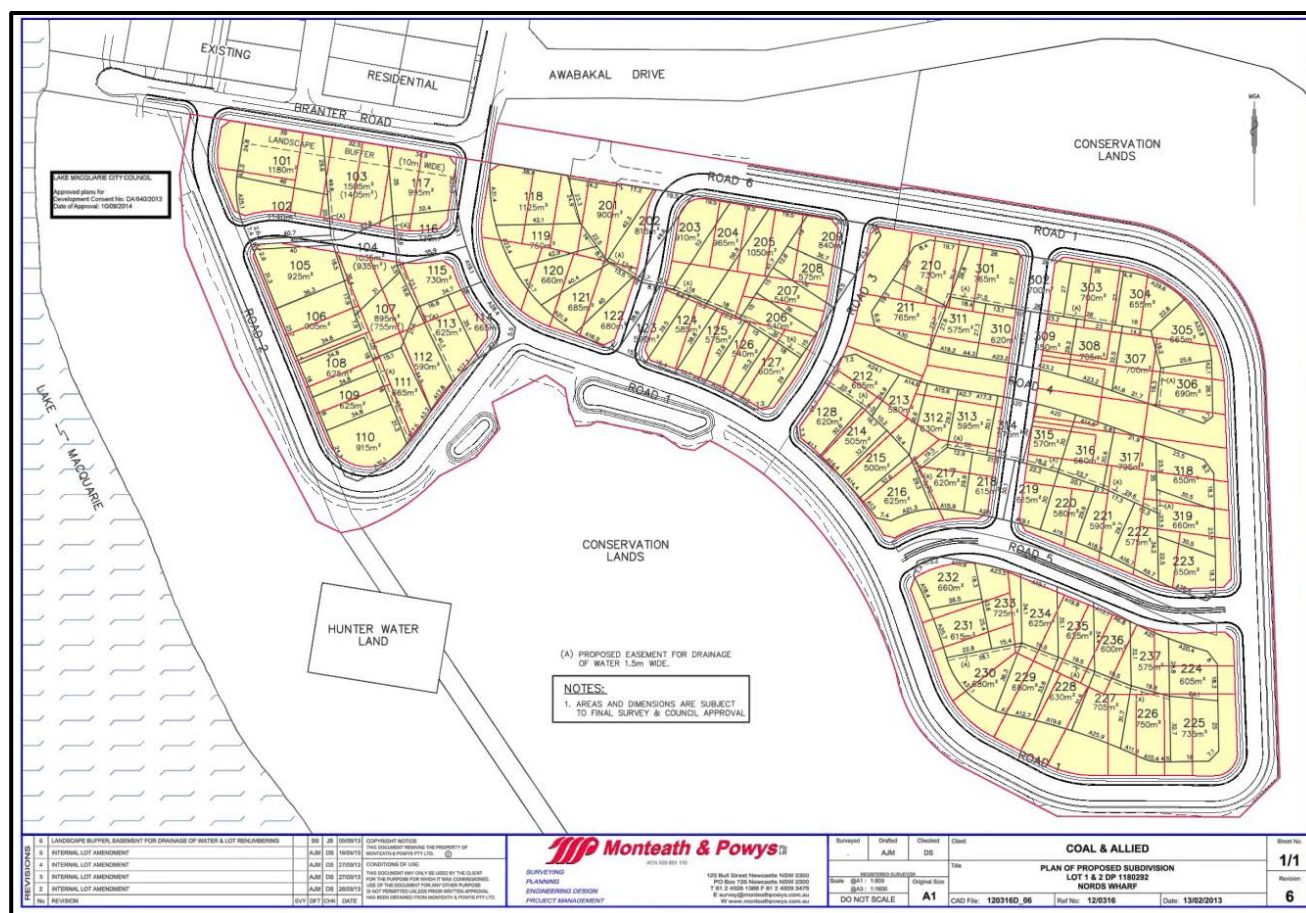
Overlay of amended subdivision plan on approved DA plan.
